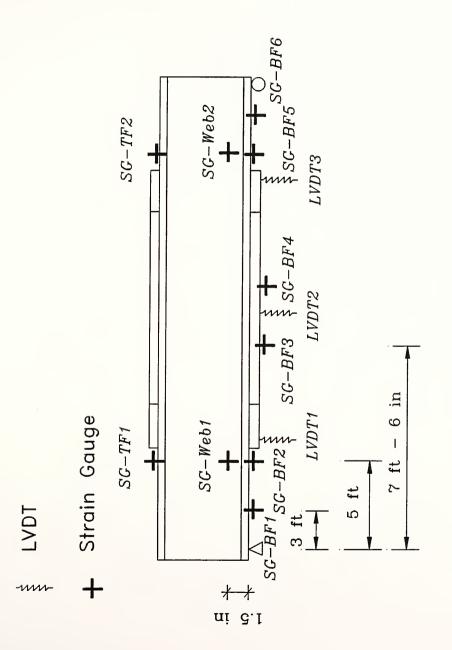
Lay-Out of Strain Gages and LVDTs.
